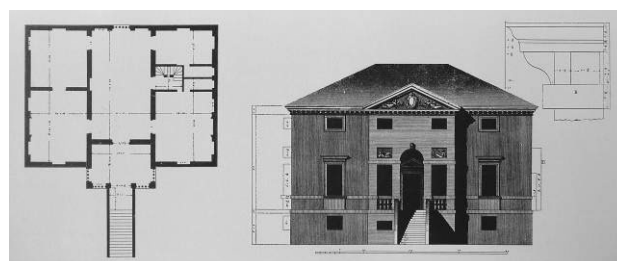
Plan of the first floor and elevation of Villa Forni Cerato in the drawings of Bertozzi Scamozzi.
